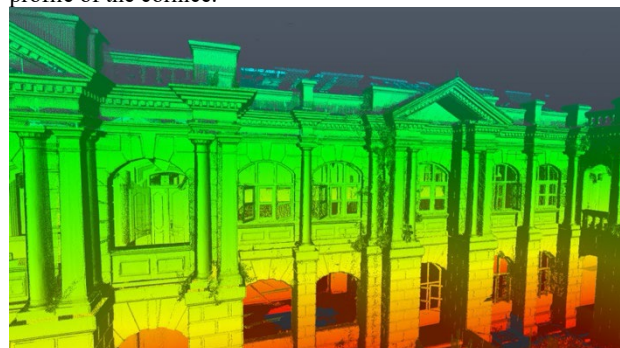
Elevation mode view for row of windows at Galeri Kraftangan Seremban front façade.
